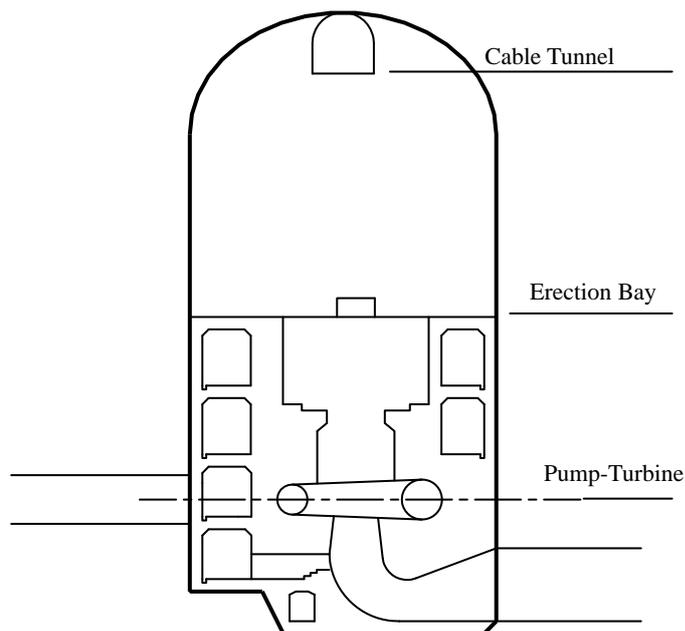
Typical Section of Powerhouse Cavern
